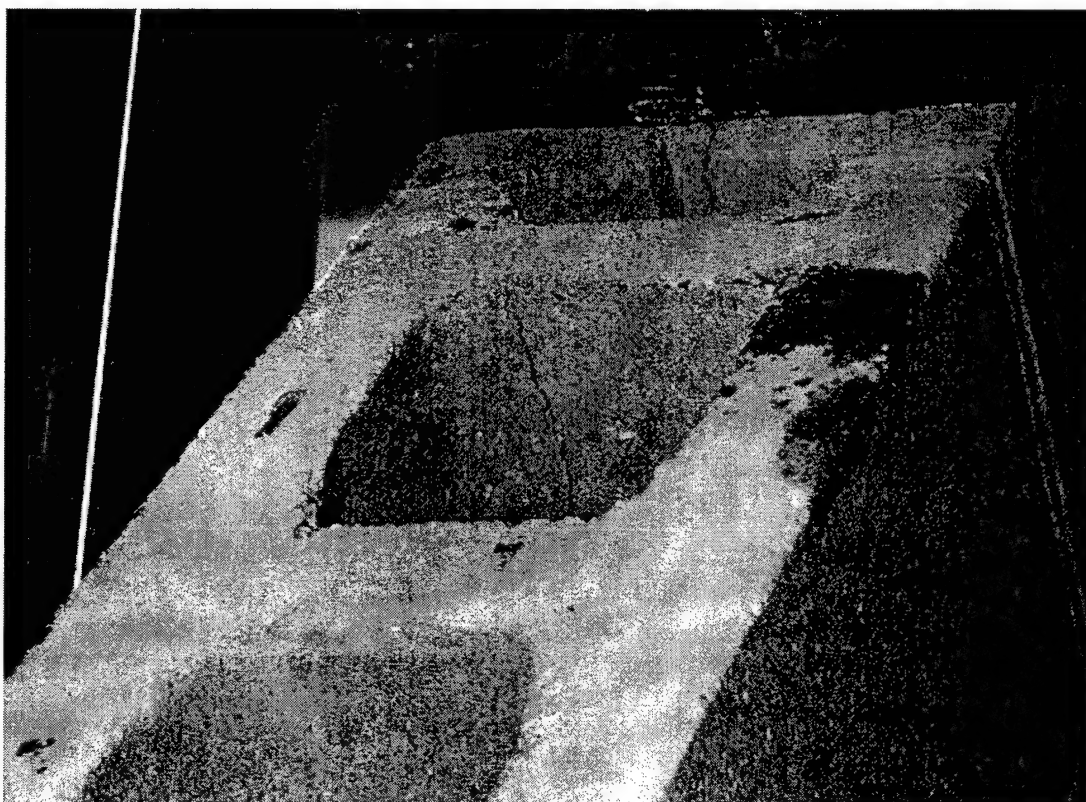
Oblique view of concrete block from Wall 6 showing internal cracks that appeared at 30,000 lb load.
